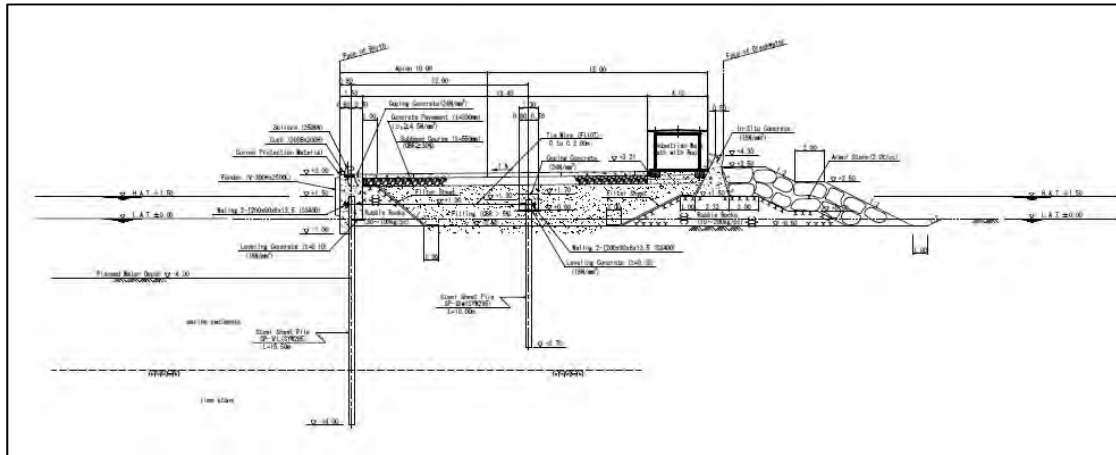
Cross-section of the berth/cargo yard (breakwater side)
